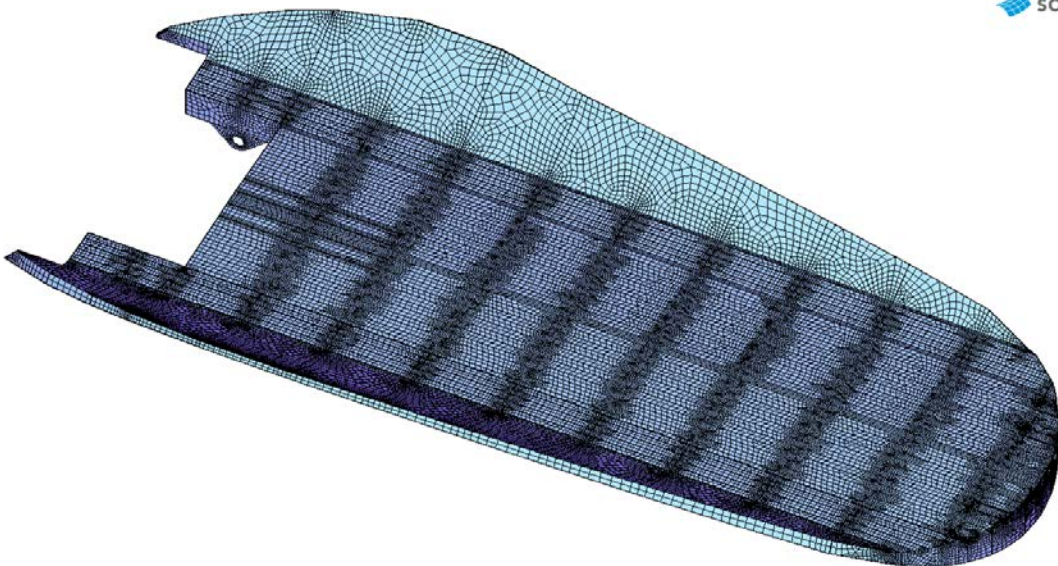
SBR Global Model – 3D view of Lift Span deck in isolation
